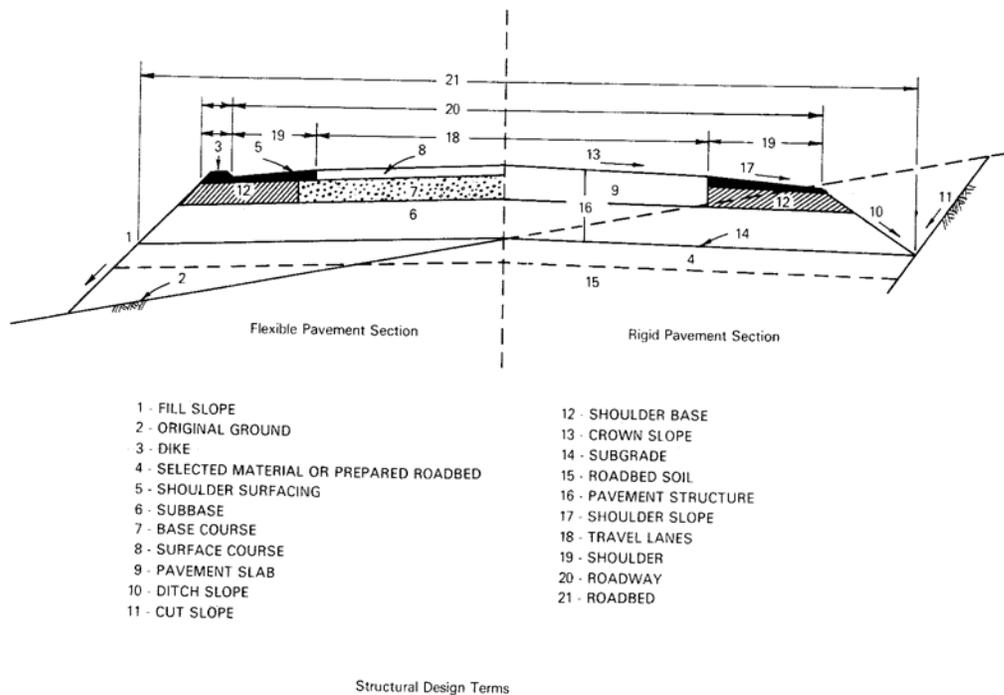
Typical sections for rigid and flexible pavement structures.
